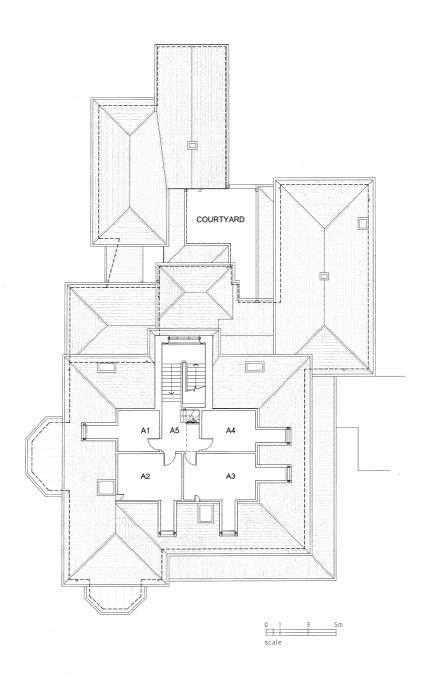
Attic plan of the House, existing conditions, not to scale. Source: Tanner Architects 2010.
